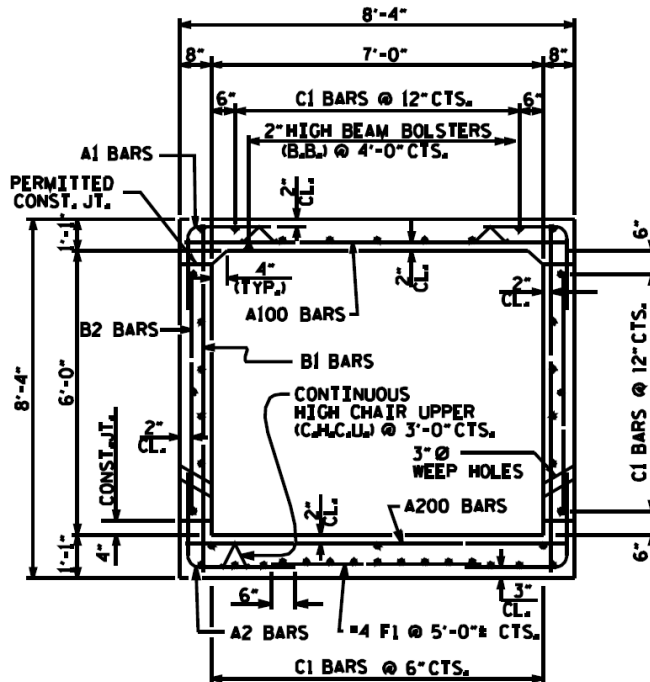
NCDOT Single Barrel Cast-in-Place Box Culvert Cross Section Example (NCDOT 2007)
